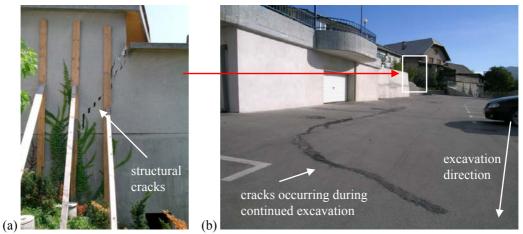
(a) Damage to the side of building C28 showing the cracking due to differential foundation settlement (b) cracking in the adjacent parking lot following original topography
